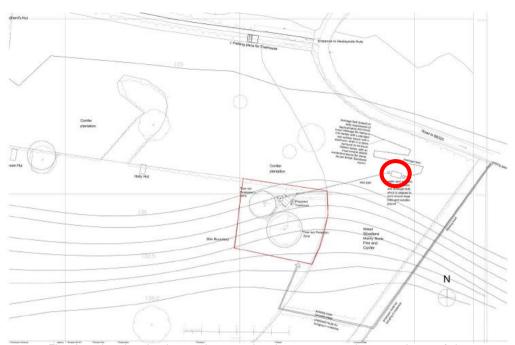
Location plan showing tree house and package treatment plant to north east of site
